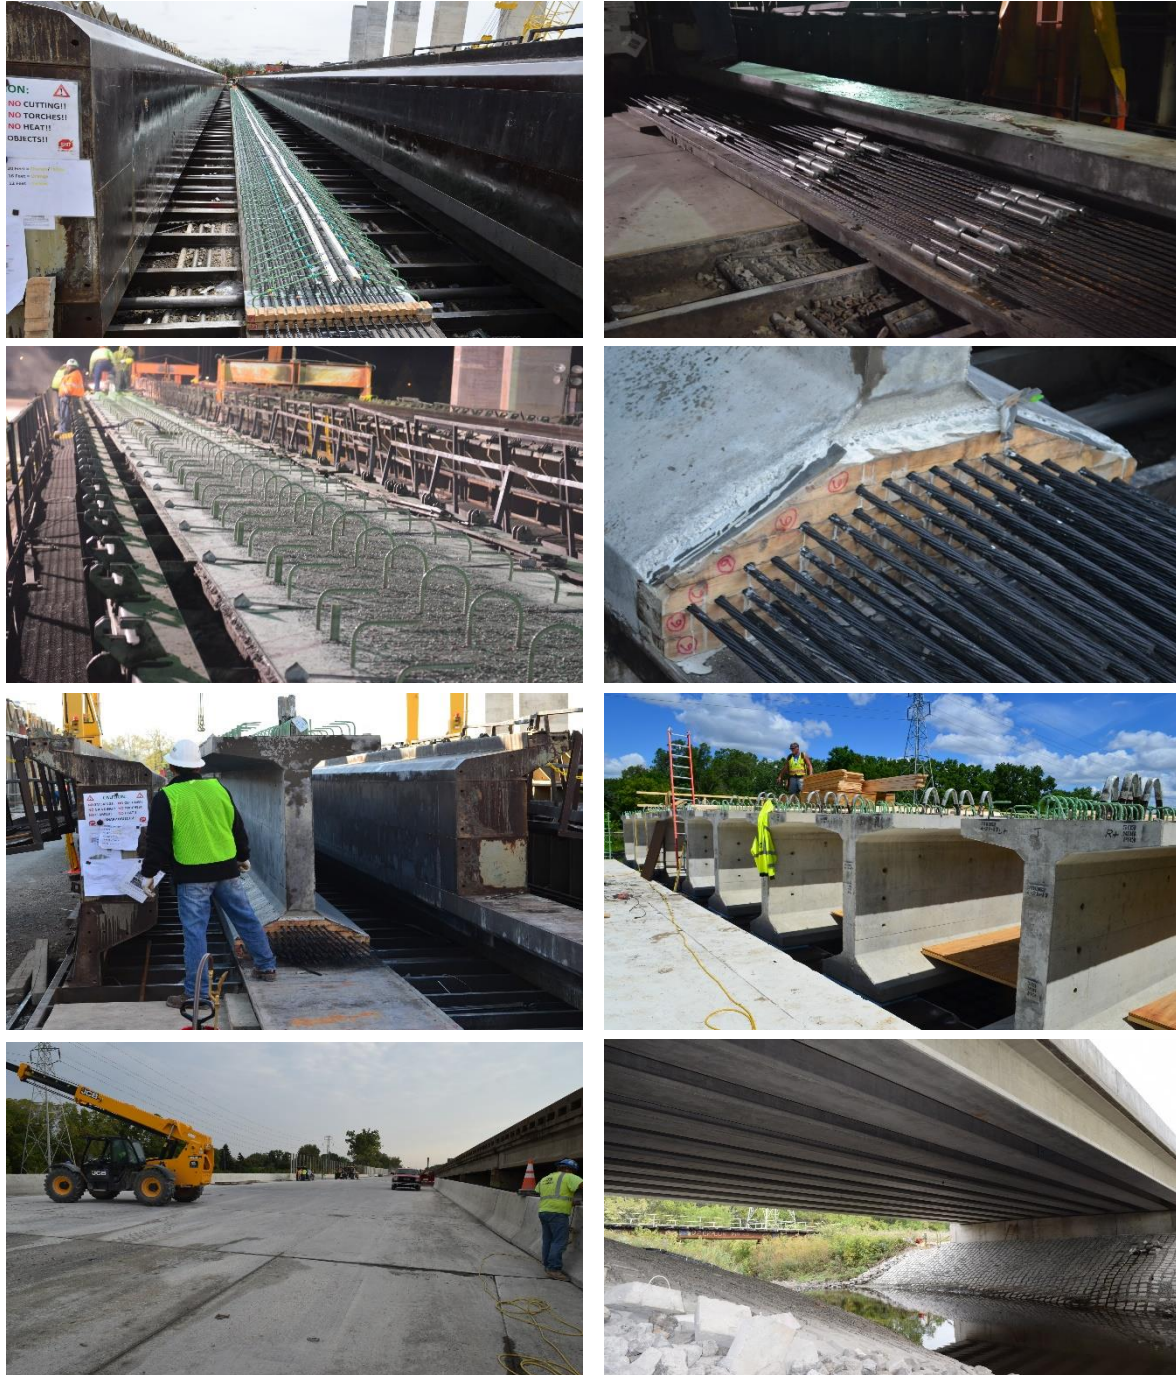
Construction of I-75 bridge over Sexton/Kilfoil Drain
